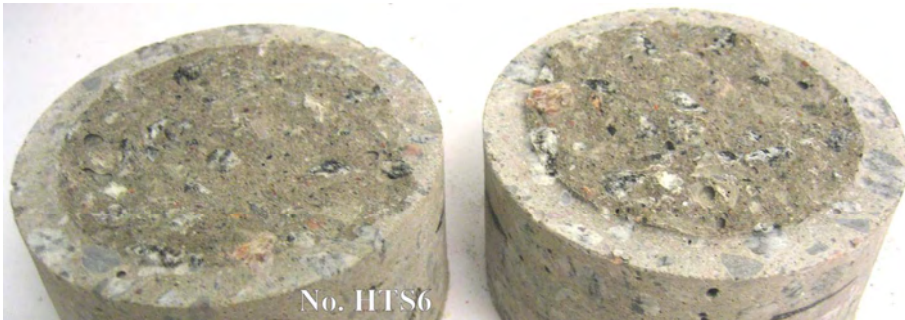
Photograph showing the failure surface for test No. HTS6 after tensile test.
